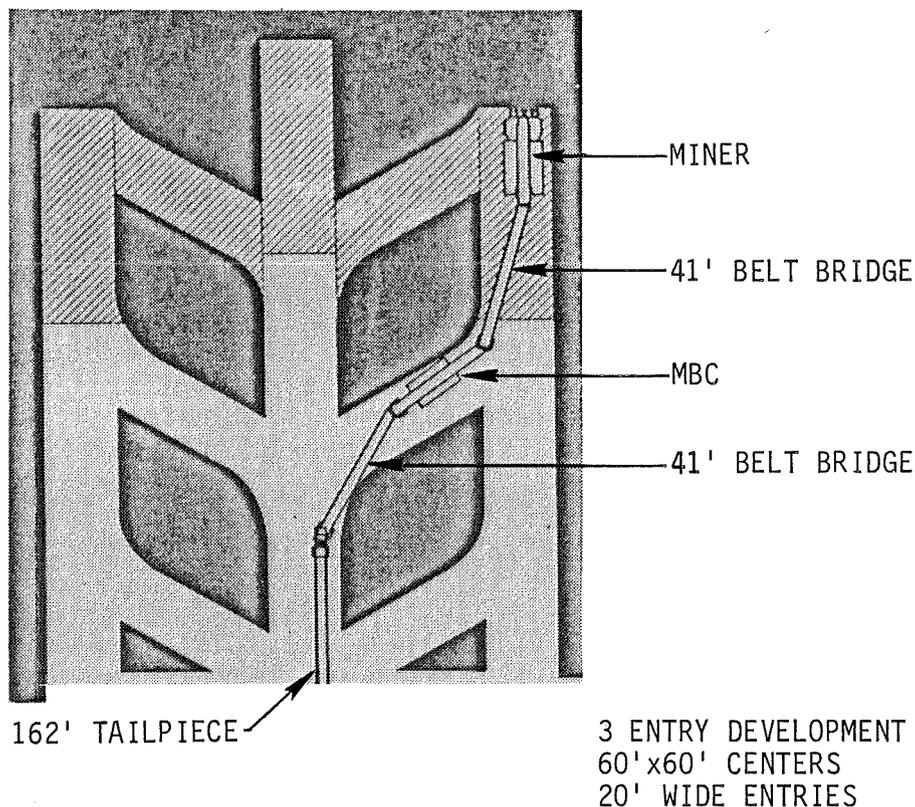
Entry mining plan with 3-element bridge conveyor bridge carrier haulage system.
